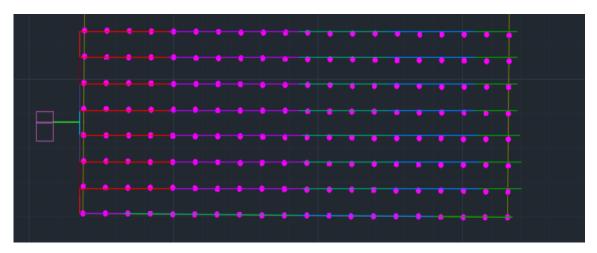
Detailed layout of sprinkler irrigation system in a hydro-zone
